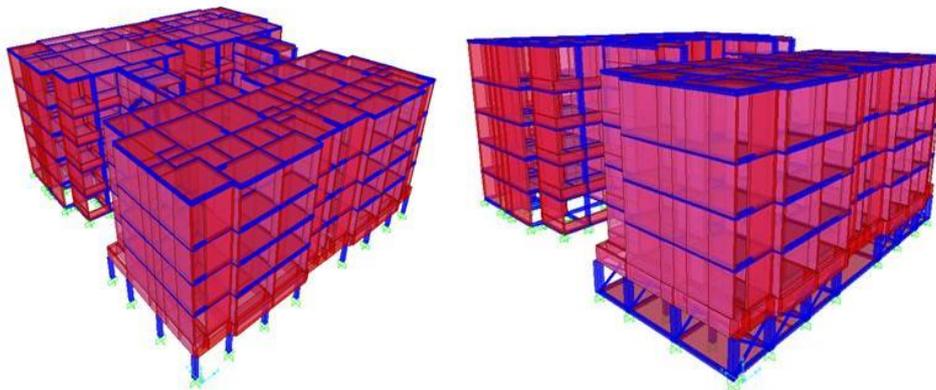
Original and reinforced structural models of building 3 with “weak ground floor”
